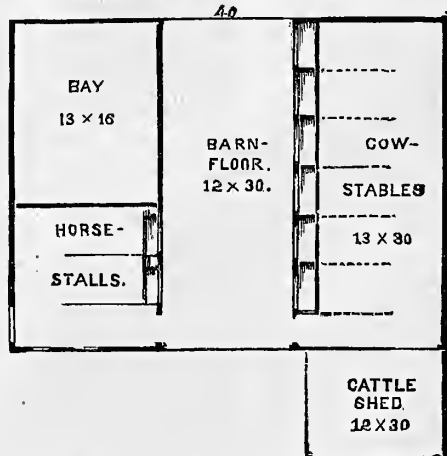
THE FLOOR PLAN OF THE BARN.
